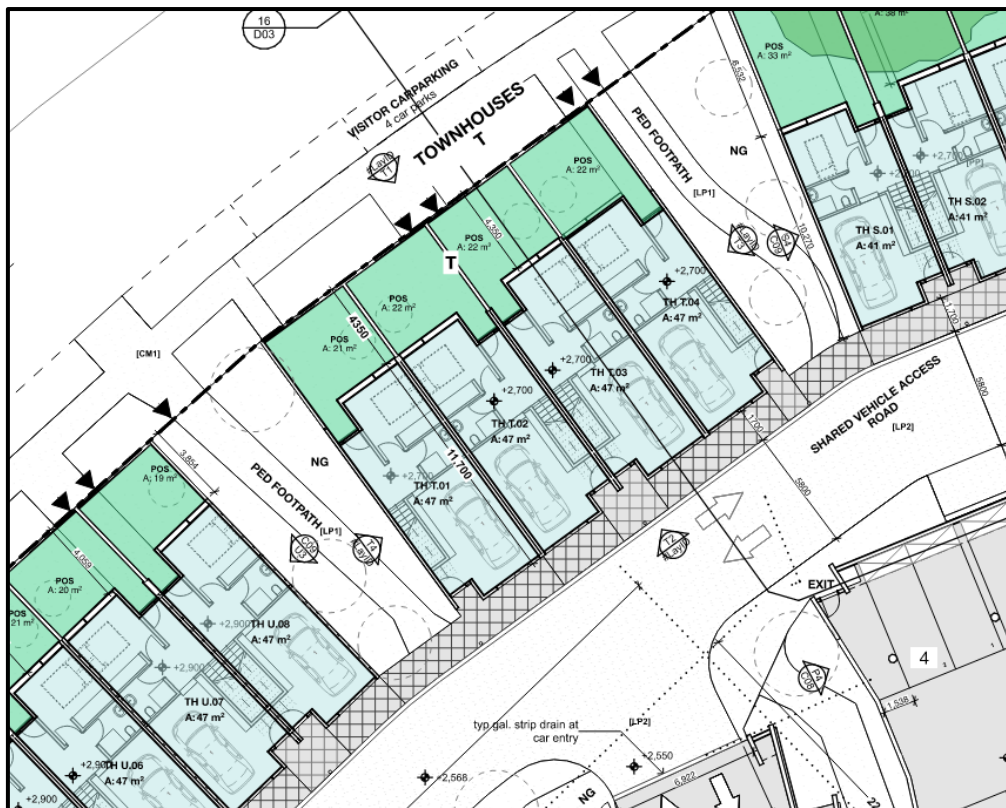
The layout of the Townhouses fronting Cadbury Road showing the ground level private outdoor space conveniently located to the habitable rooms of the dwelling.
